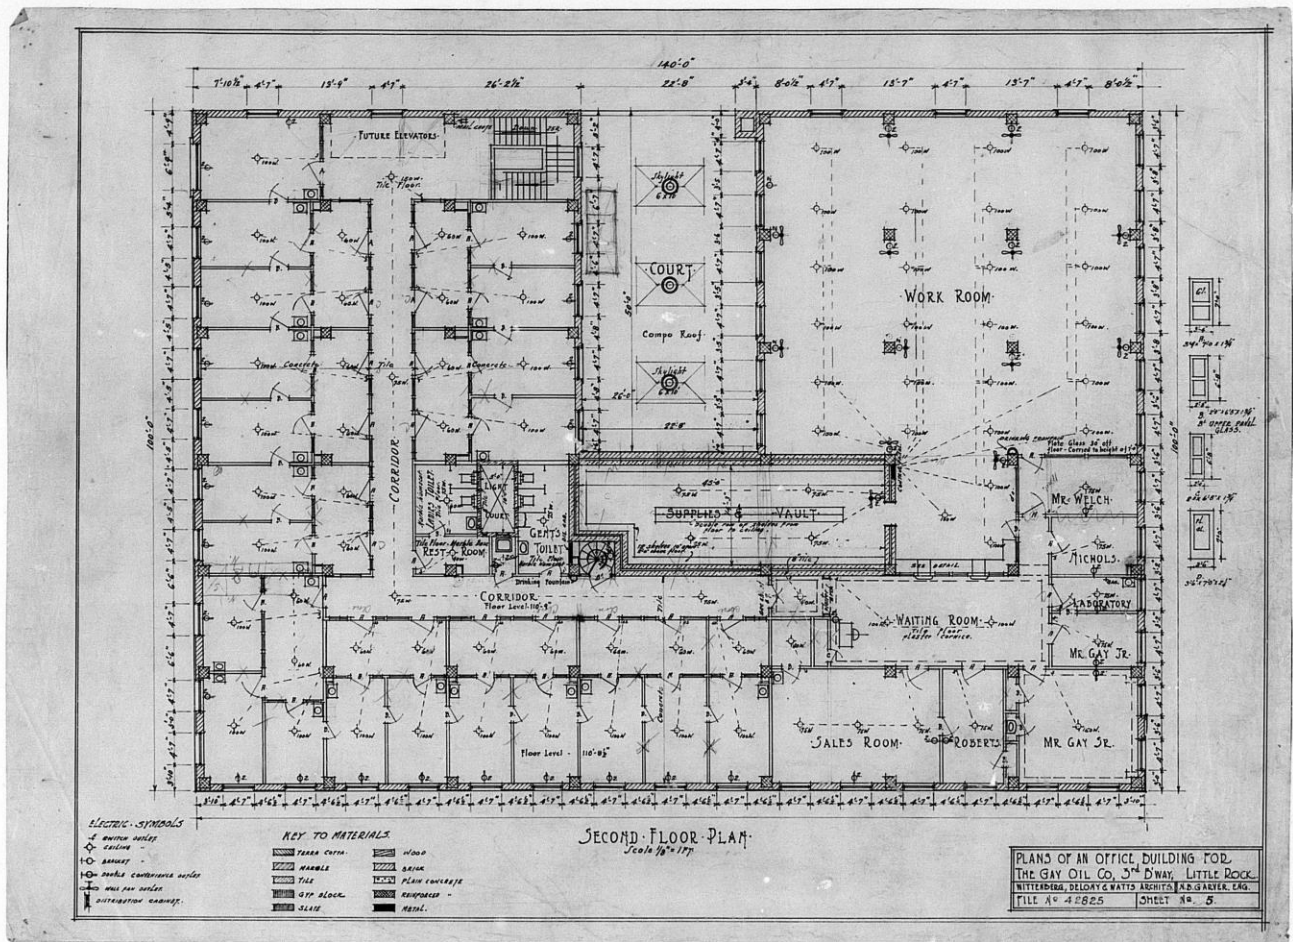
Second Floor Plan Drawing for the Gay Oil Company Building
